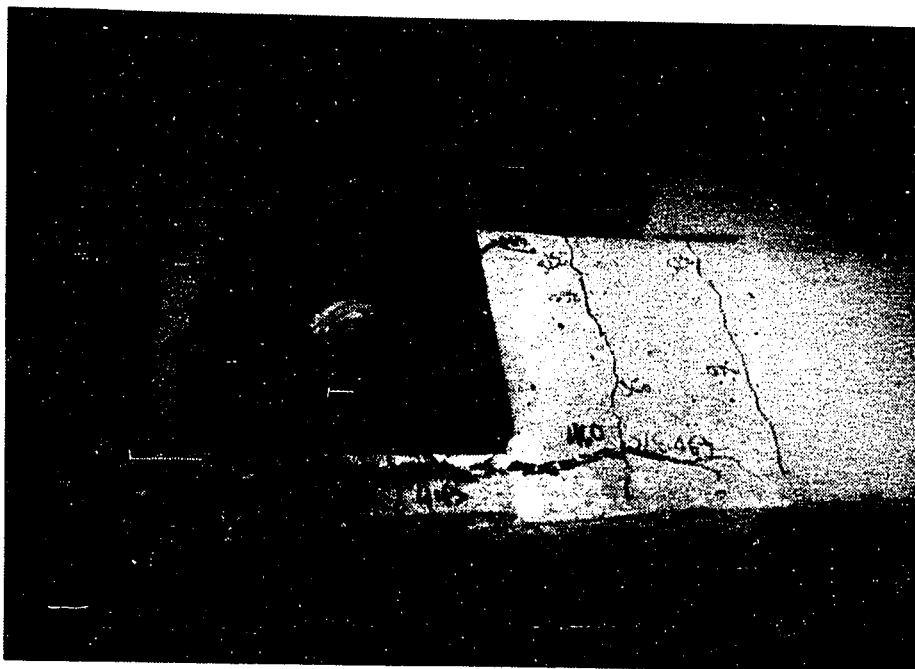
Spalling Cracks, Specimen E2
